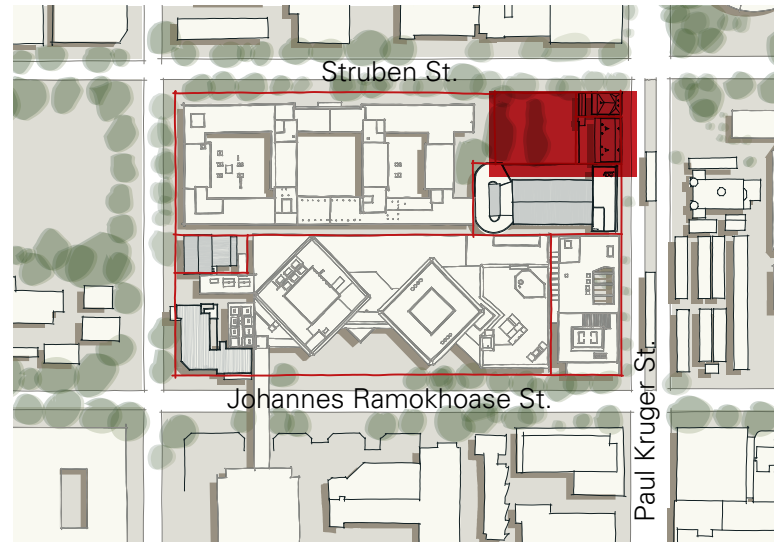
Light to dark shading of buildings indicates the scale of buildings from small to very tall (Author, 2022)
